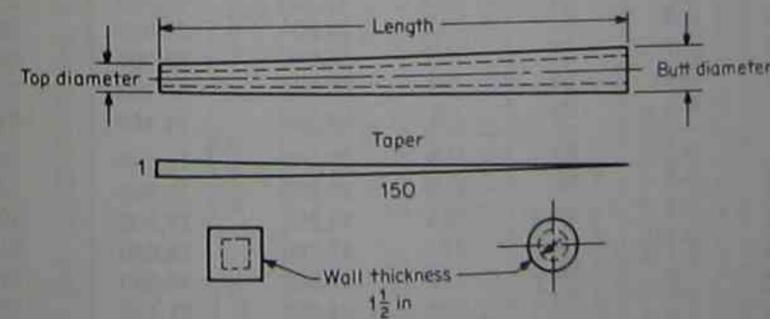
Typical reinforced concrete hollow distribution pole. (Adapted from Centrecon, Inc.)
